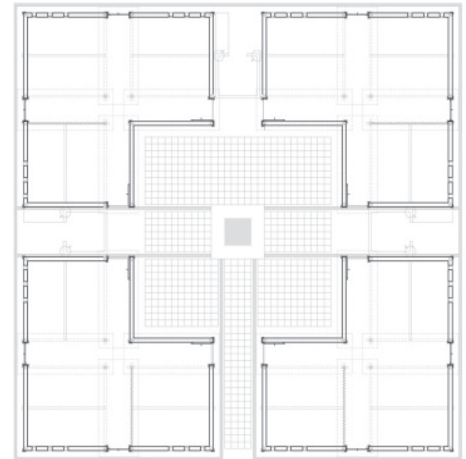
Re: Build school plan, AL Zaatari camp Source: Pilosio Building Peace.
